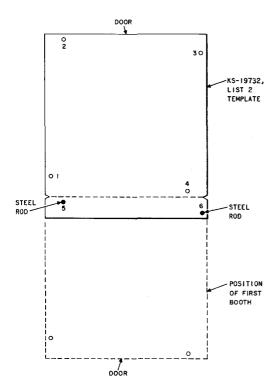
Back-to-Back Layout for Drilling Mounting Holes
